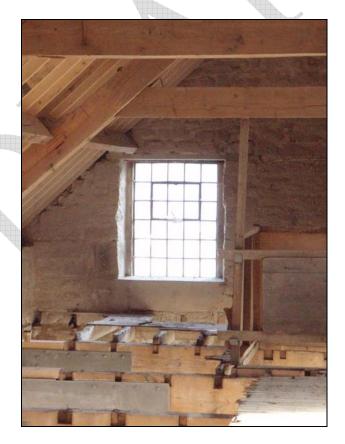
Photograph of a window in the south-east façade of the mill (facing south-east) (scale = 2m).
